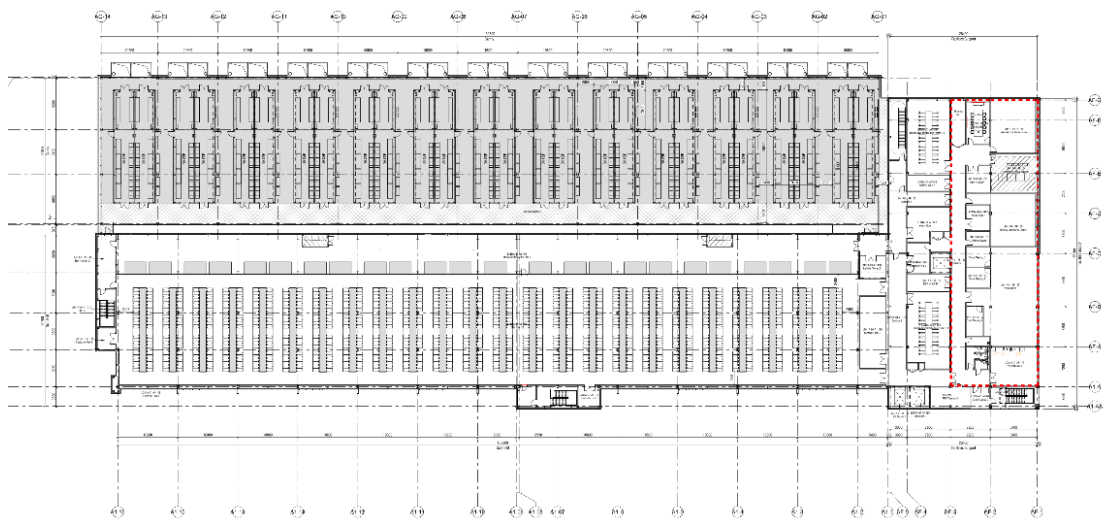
First Floor Gantry Layout – CEP and FS Containers
